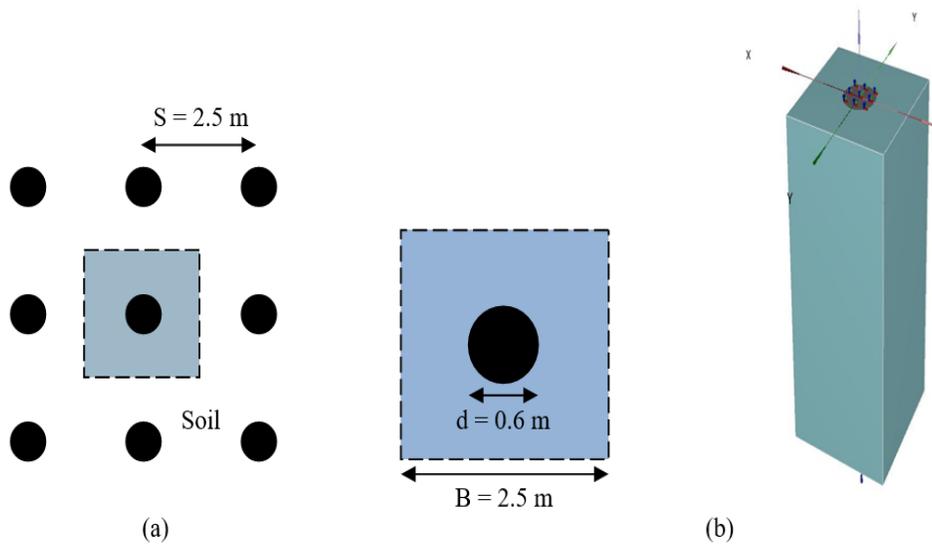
Three-dimensional column: (a) column layout; (b) 3 D column.
